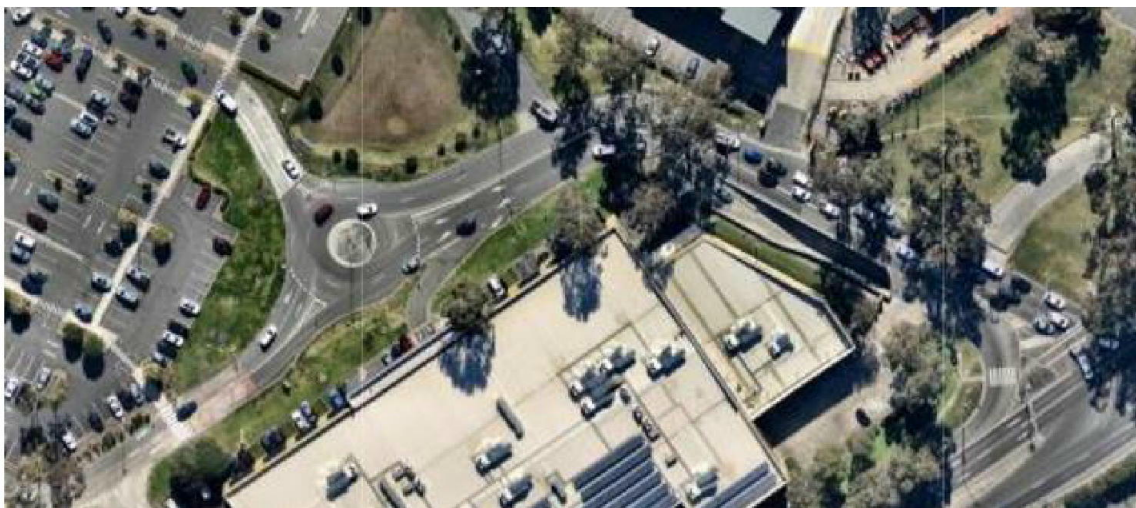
Existing Wolseley Road carriageway and roundabout to be realigned
